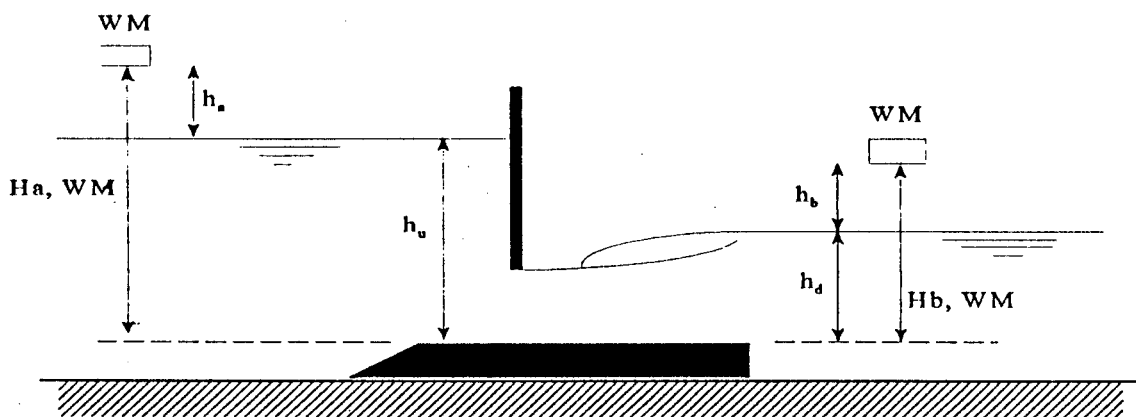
White Marks on outlet structures in the Chishtian Sub-Division.
